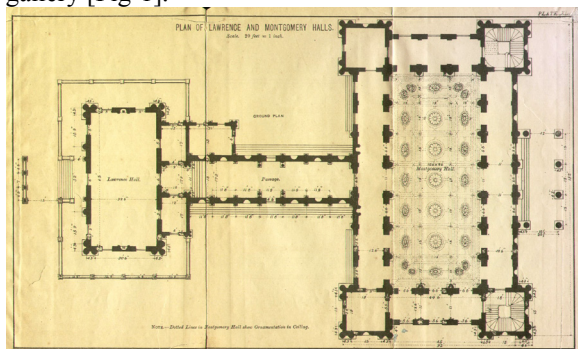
Plan of Lawrence and Montgomery Halls 1877
